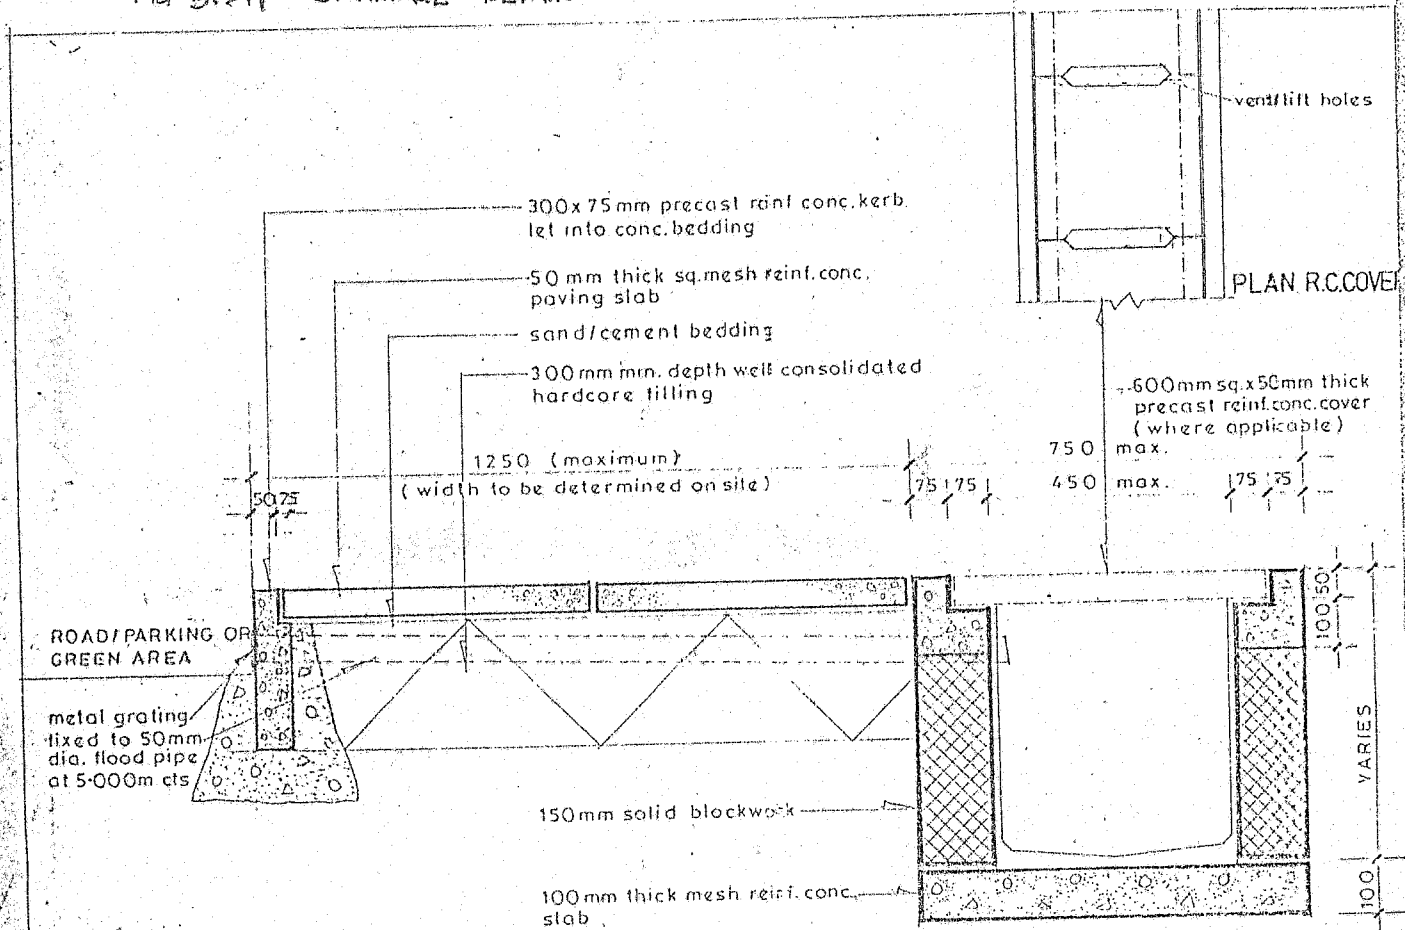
STORMWATER DRAINAGE WITH PAVED WALKWAY DETAIL
